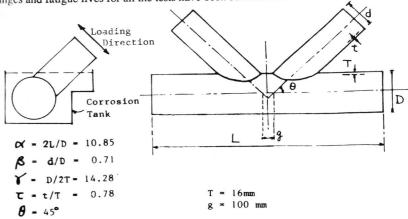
SCHEMATIC DRAWINGS SHOWING THE GENERAL AR-RANGEMENT AND DIMENSIONS OF K JOINTS TESTED IN CORROSIVE ENVIRONMENT UNDER OUT-OF-PLANE BENDING
